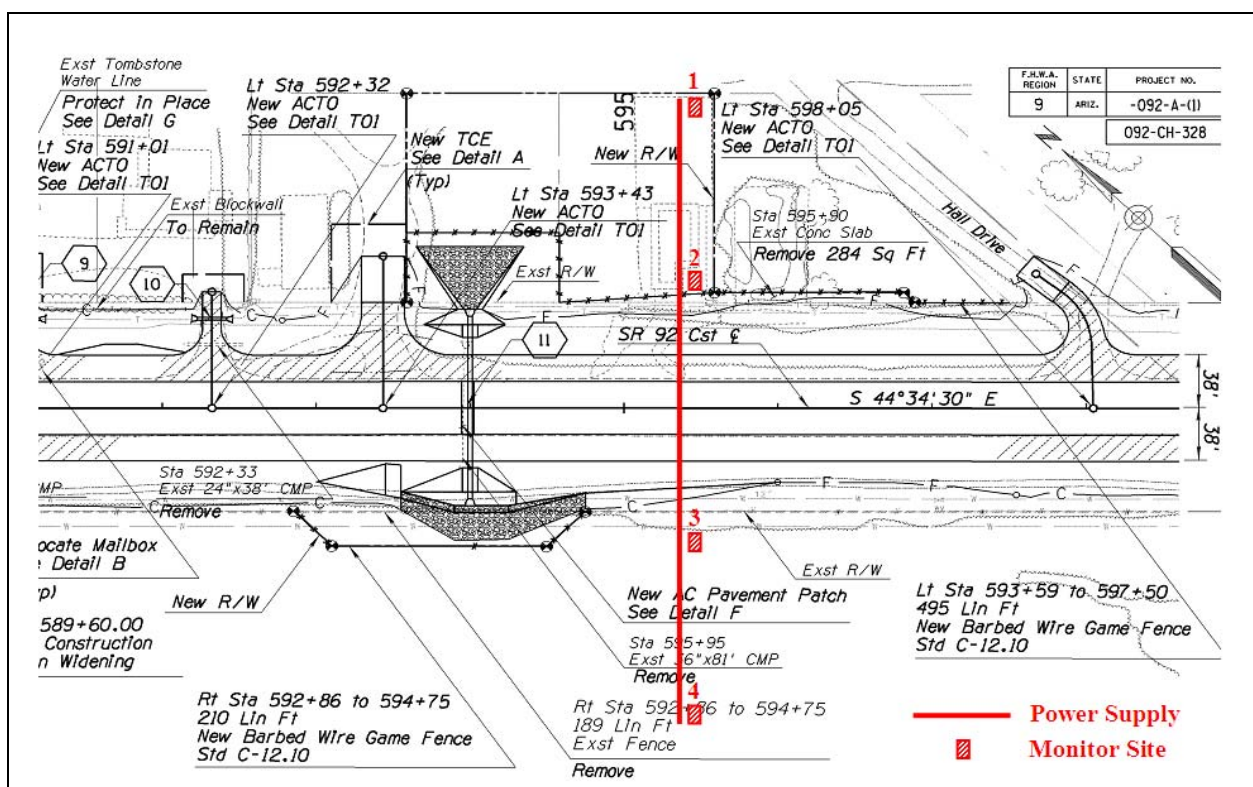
Placement of monitoring trailers with respect to SR 92 construction.
